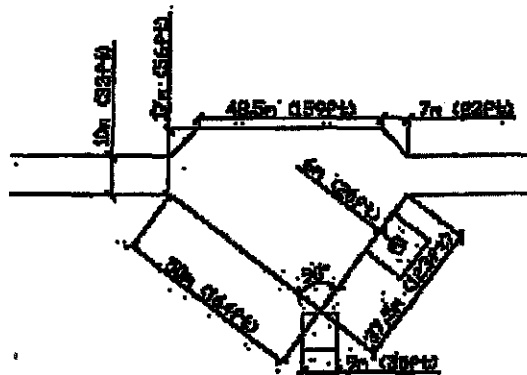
Example of crane hardstanding - assembling a mobile / conventional crane.
